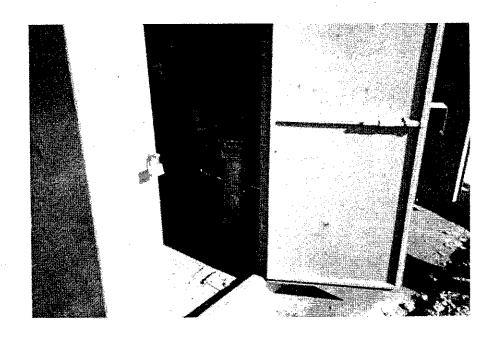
Photographs of Lopez Dam Intake Tower and Low Level Inlet Structure.
